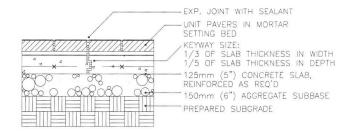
Keyed expansion joint in brick paving on concrete base. Formed with pre-molded expansion joint filler. Seal joint from water infiltration.
